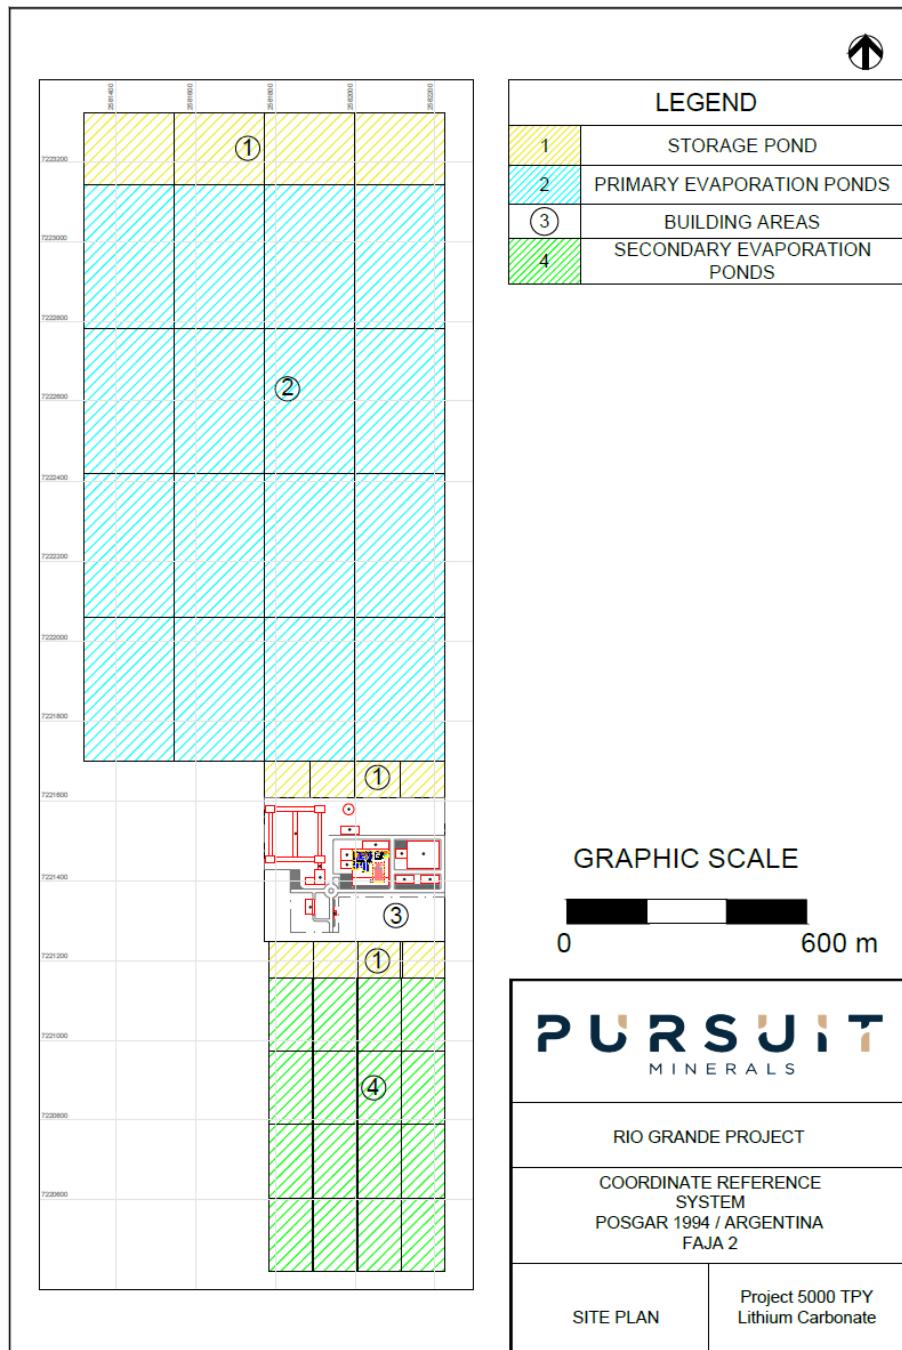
Solar Evaporation Pond Layout and Pond Geometry.
